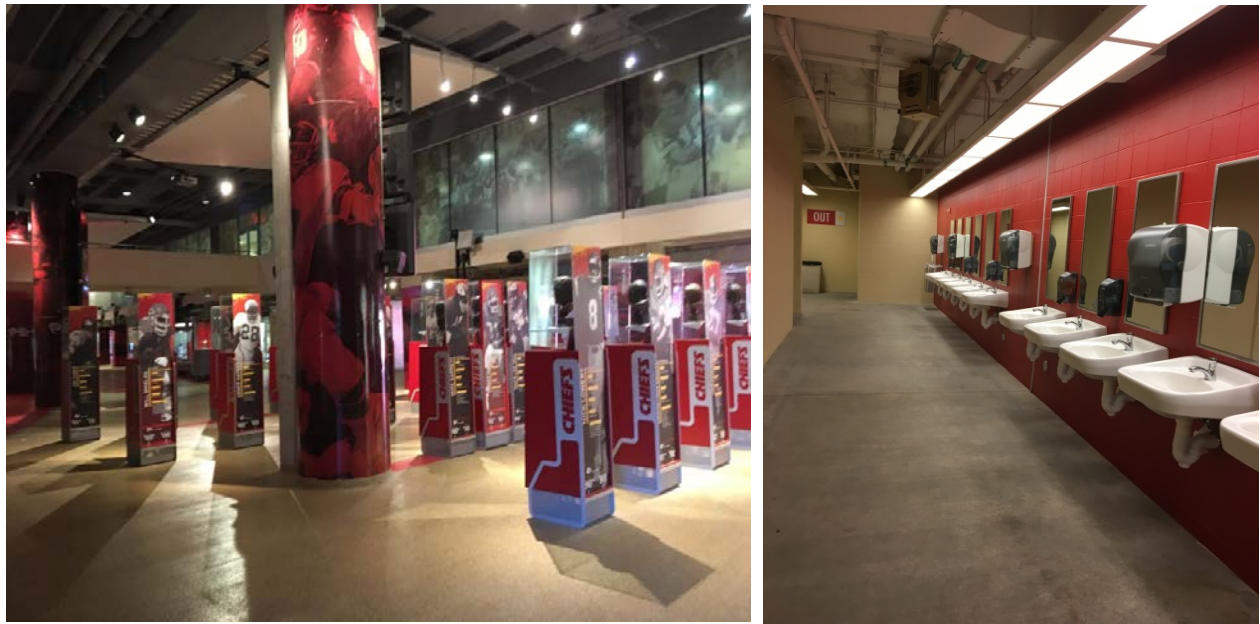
Epoxy Flooring (left) and Exposed Concrete (right) Throughout Facility
